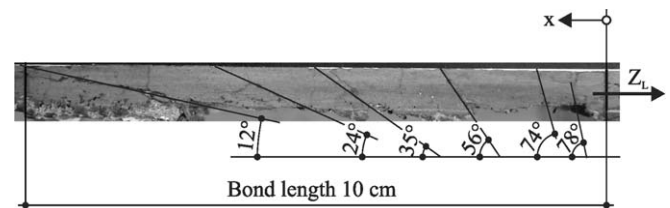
Crack pattern of a strengthening layer in the bond length with dimensioning.
